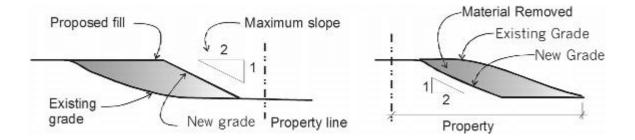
(B): Illustration of fill and cut with maximum slope 2:1.
